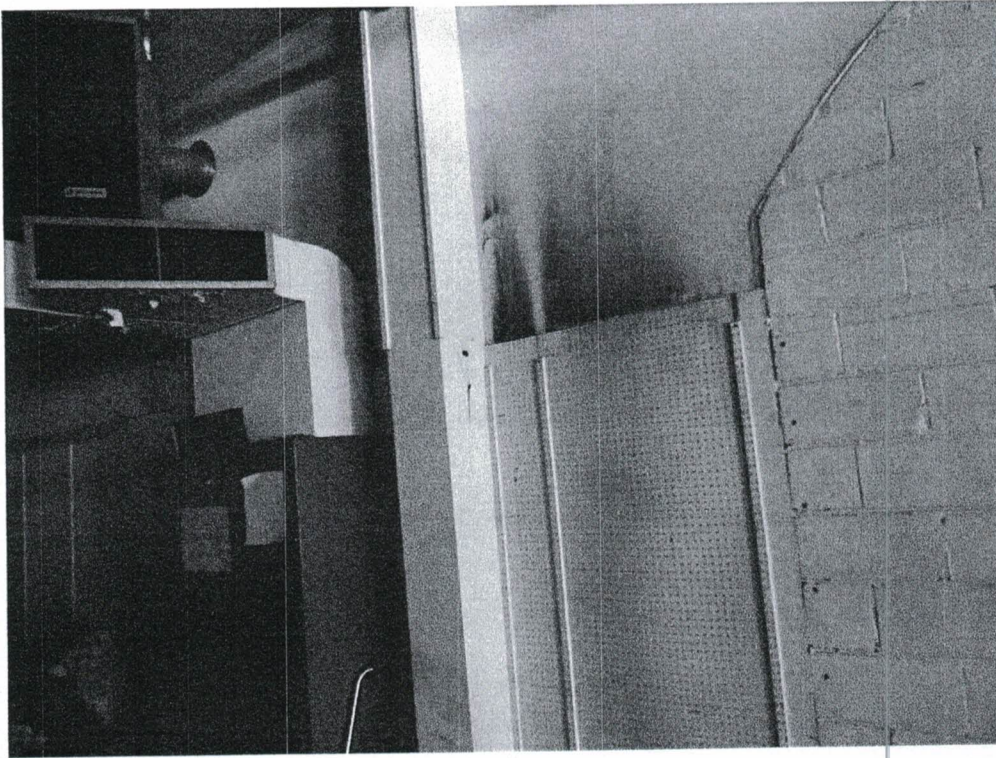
Soot is on the front elevation along the common wall of buildings 529 and 523.
